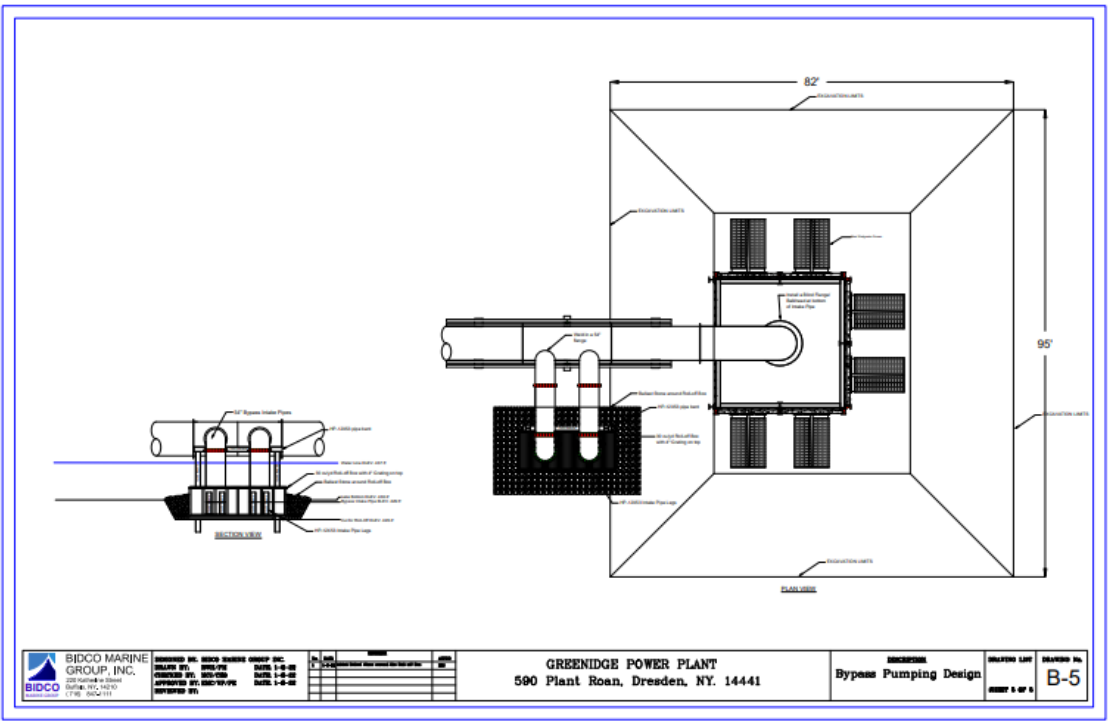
Plan view of new intake structure with 82 ft x 95 ft dredged area, and temporary by-pass intakes in plan and elevation view.
